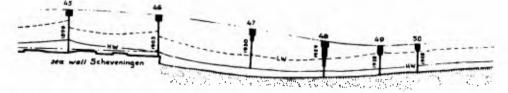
The principle of shortening, Scheveningen, Holland: Thierry and wan der Burgt.
